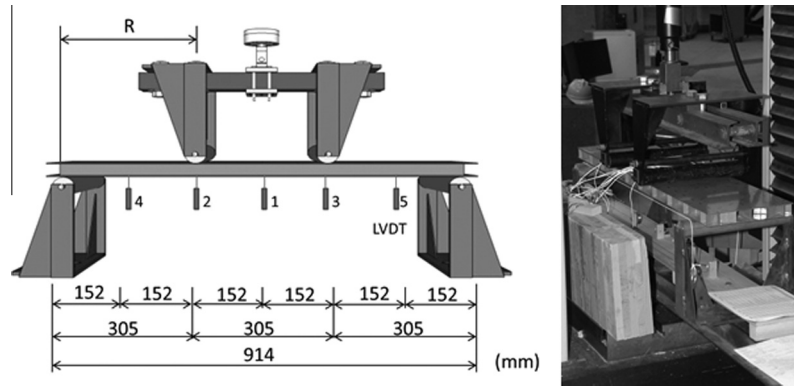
Test dimensions, lvdt locations, and set-up for four point bending test.
